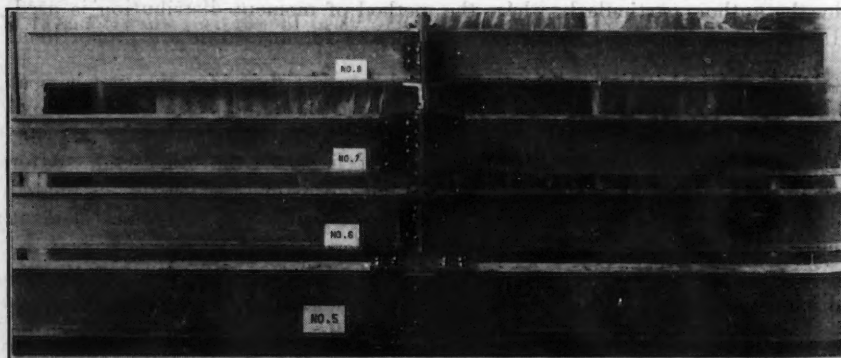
SPECIMENS 5, 6, 7, AND 8.
